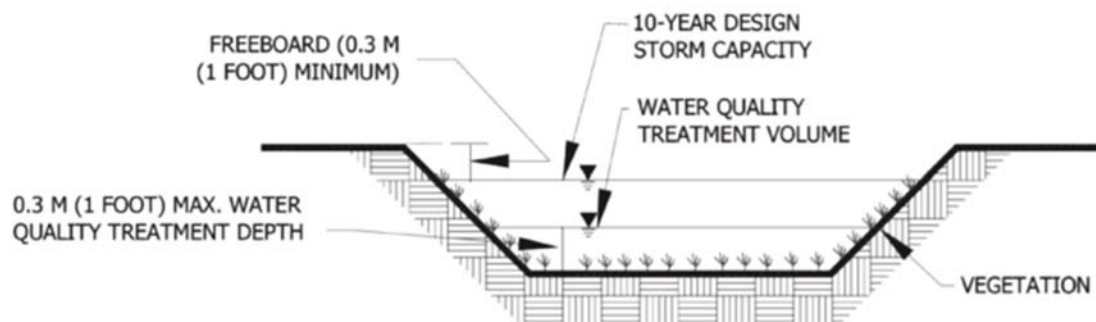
Treatment Swale Cross-Section Detail (Source: NH Stormwater Manual, Volume 2, 2008)
